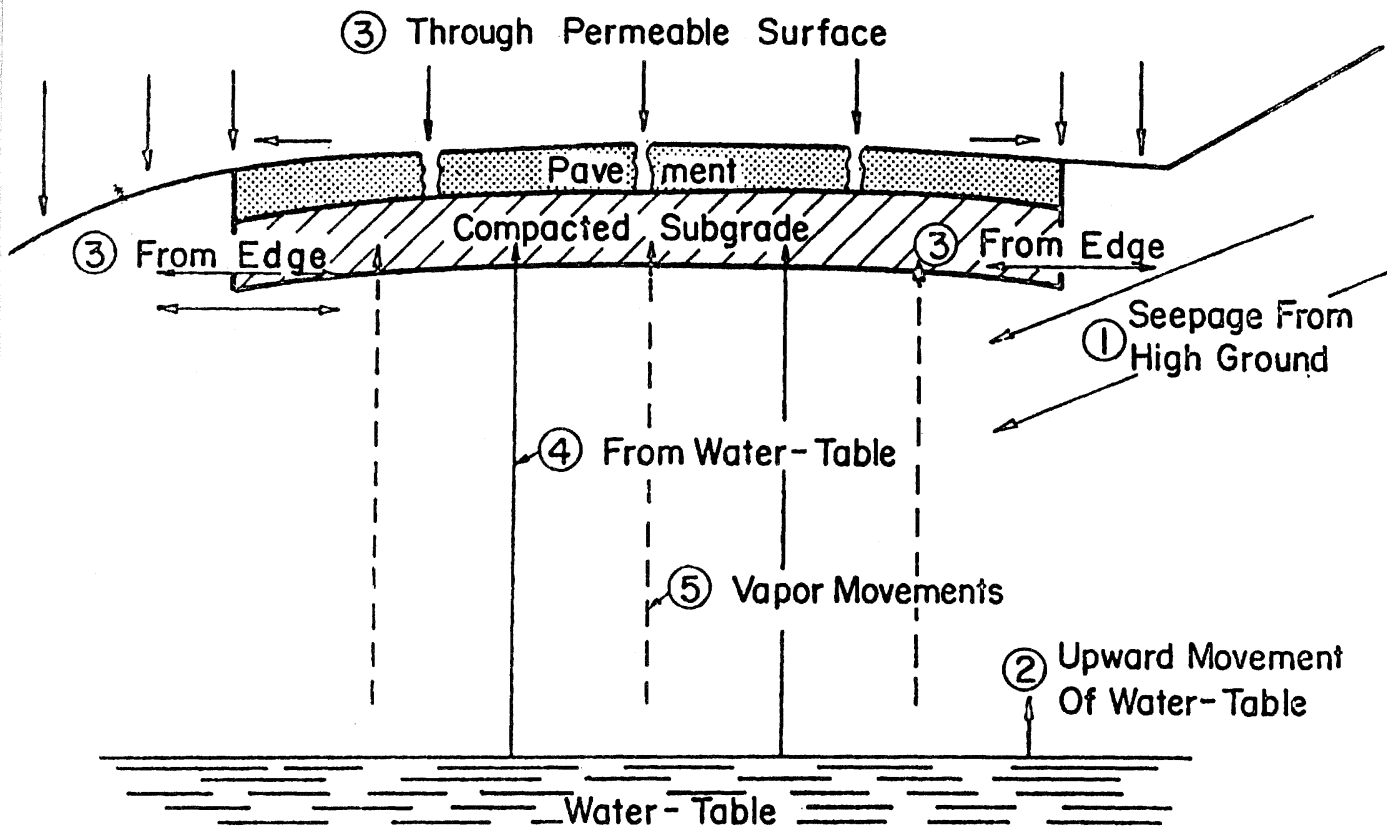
Sources of Moisture in Pavement Systems.
